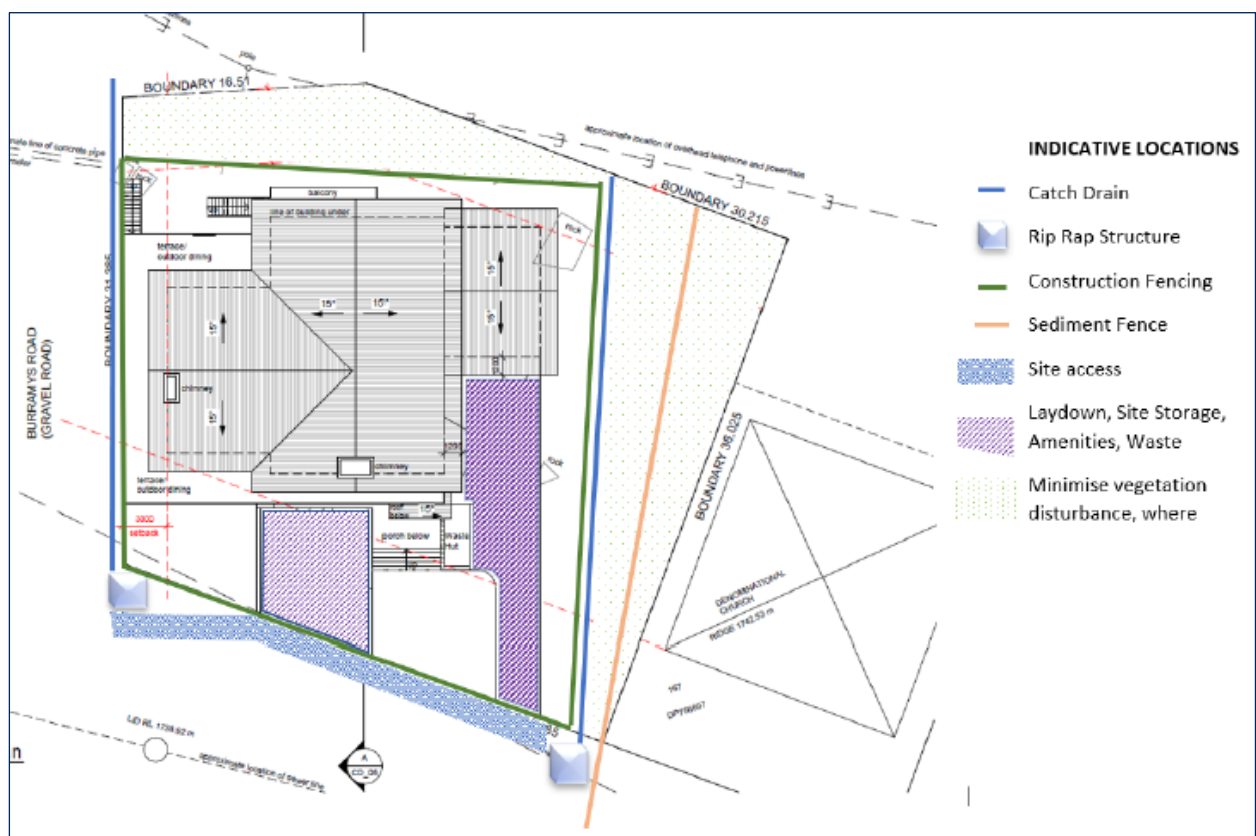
| Proposed indicative location of materials and storage, sediment fencing and site access (Source: Applicant's documentation)
